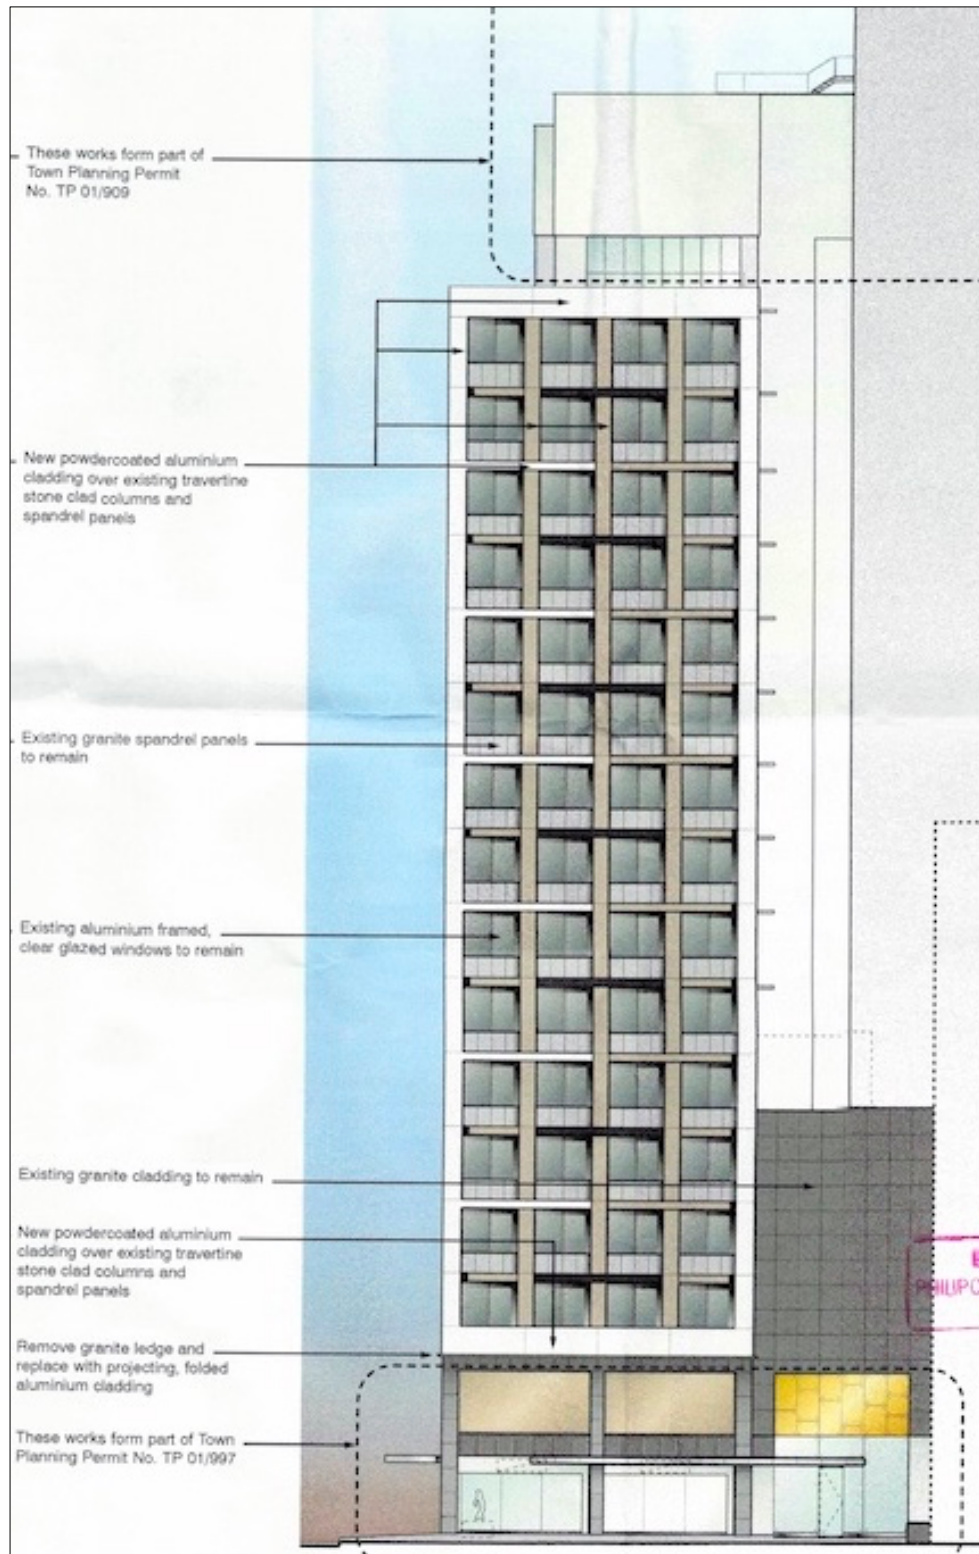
Extract from a 2002 drawing showing recladding of the Elizabeth Street facade (the same works occurred on the Collins Street facade).
